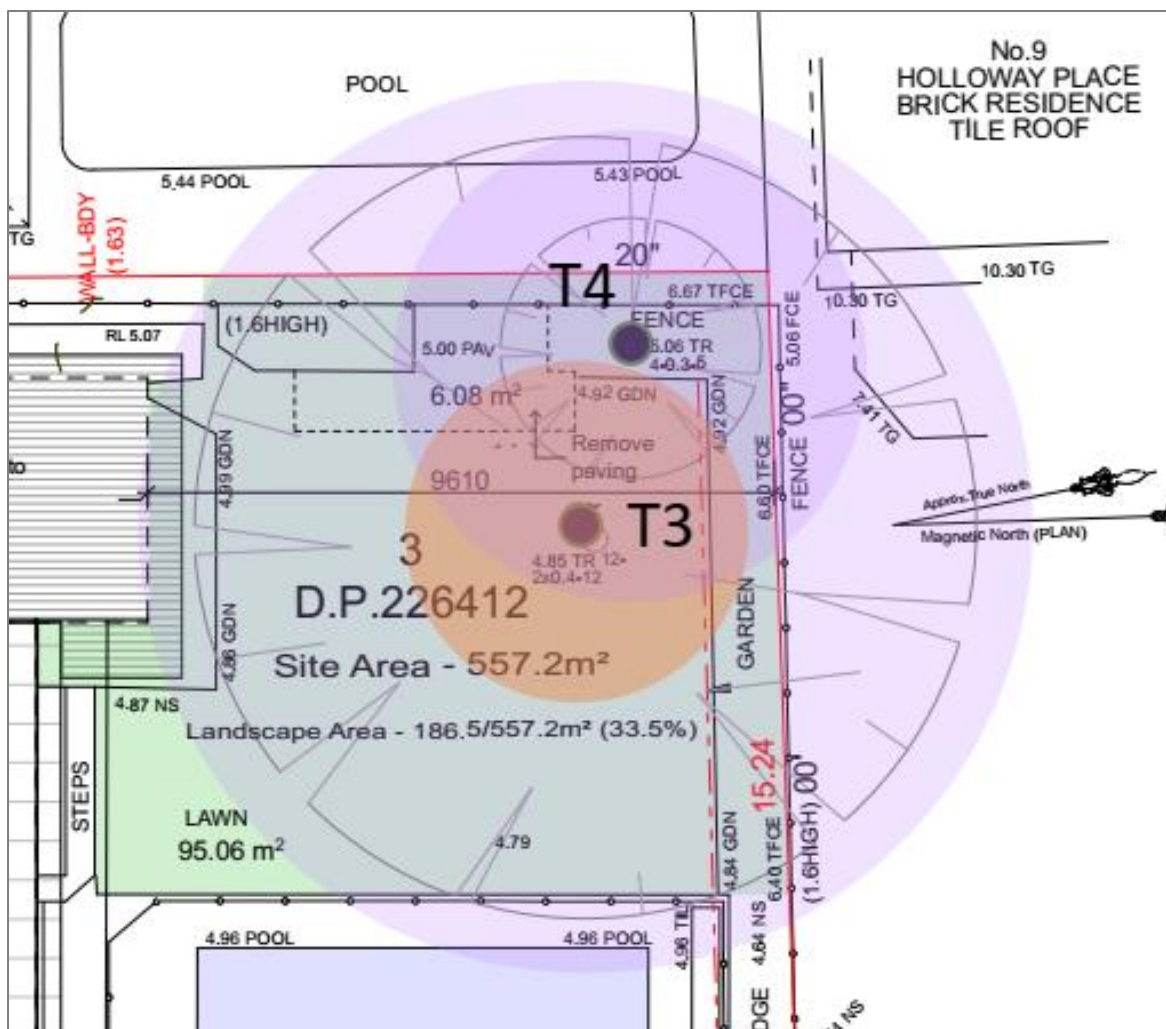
Tree 3 & 4 encroachment calculation – Purple shaded circle indicates TPZ, the orange shaded circle denotes the SRZ, green shading denotes encroachment (in this case nil). Excerpt of Site & Roof Plan, dwg no. DA01, 16/06/22 by Site Specific Designs. NOT TO SCALE. Marked up by C Hughes.
